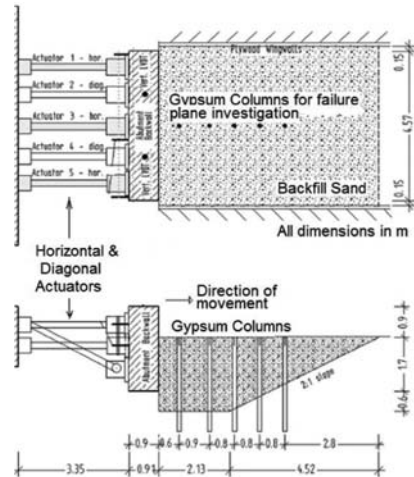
Plan view and cross-section of passive bridge abutment wall test and colored gypsum columns showing backfill deformation (modified from Lemnitzer et al. 2009).
